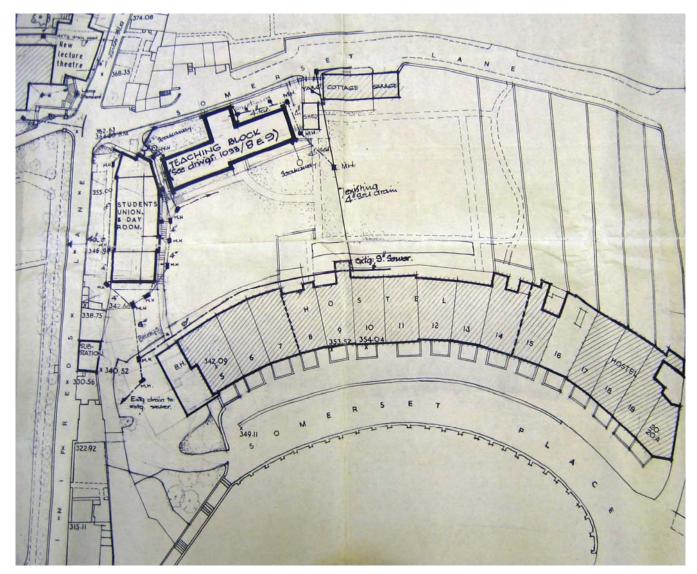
1972 proposed student union building (BRO: BC/R4764)
